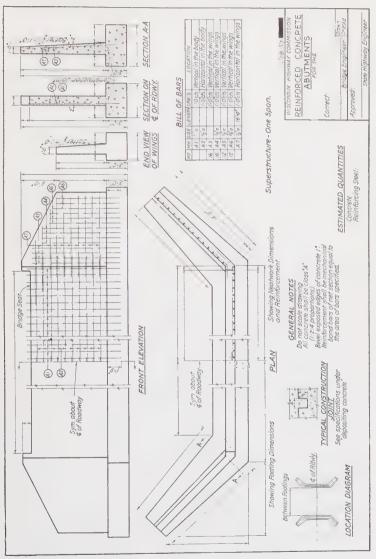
Plans for reinforced concrete slab-span abutments.
